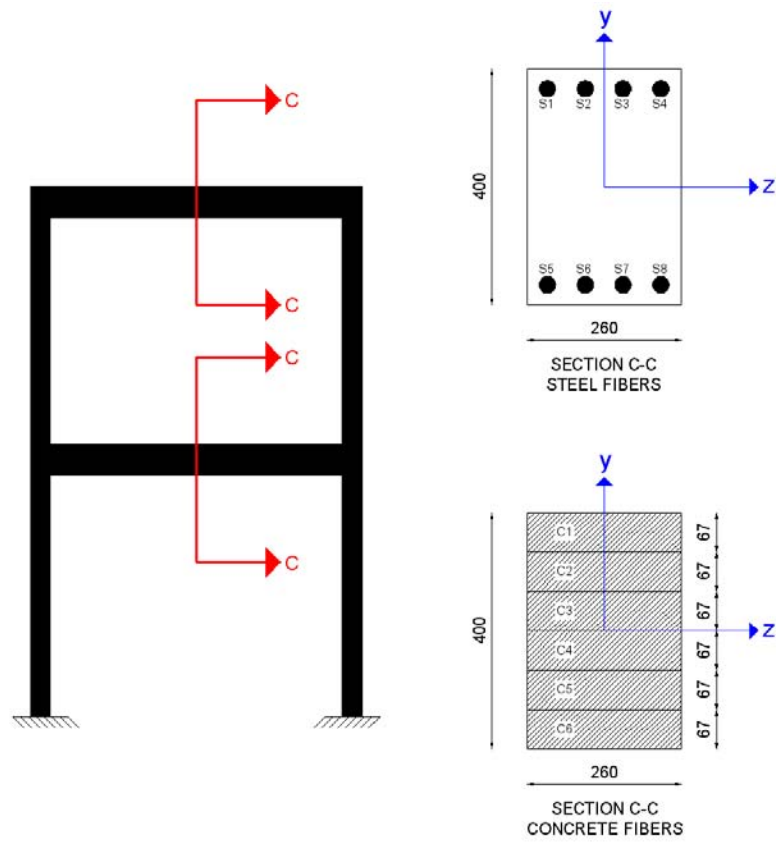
Fibers cross section for 1<sup>st</sup> and 2<sup>nd</sup> floor beams (400 · 260) in bare frame.
